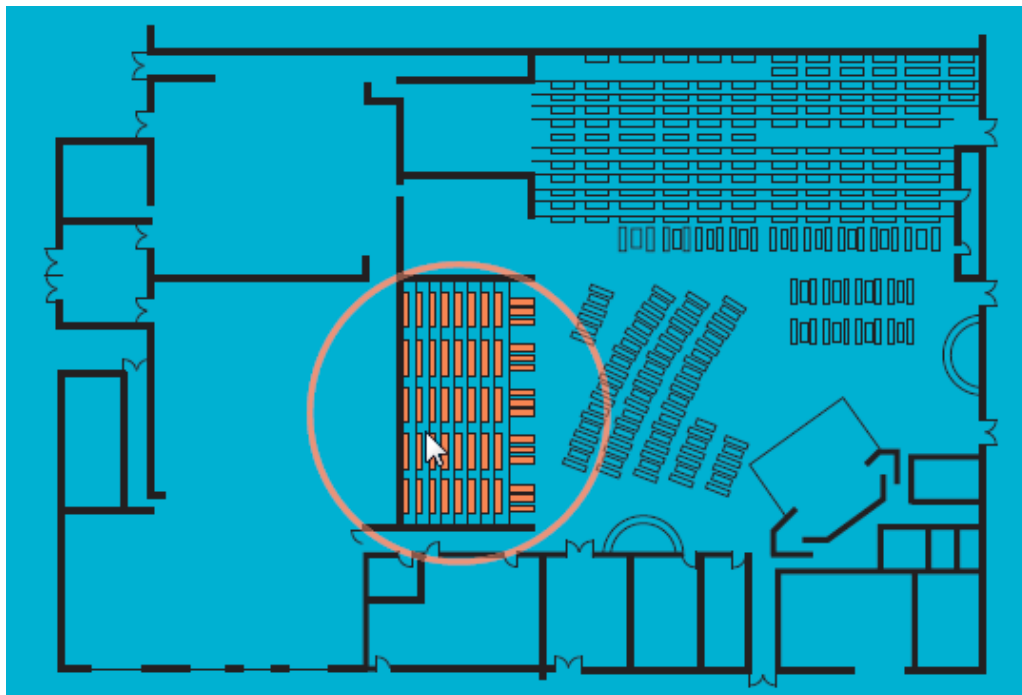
Floor layout of the disco (Image: Bo Andersson)
